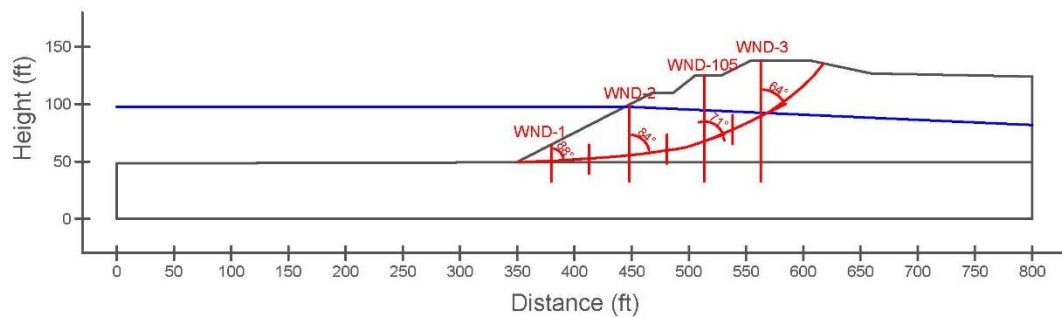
Sub-sectioning of the cross-section and failure plane for Wachusett Dam - North Dike
